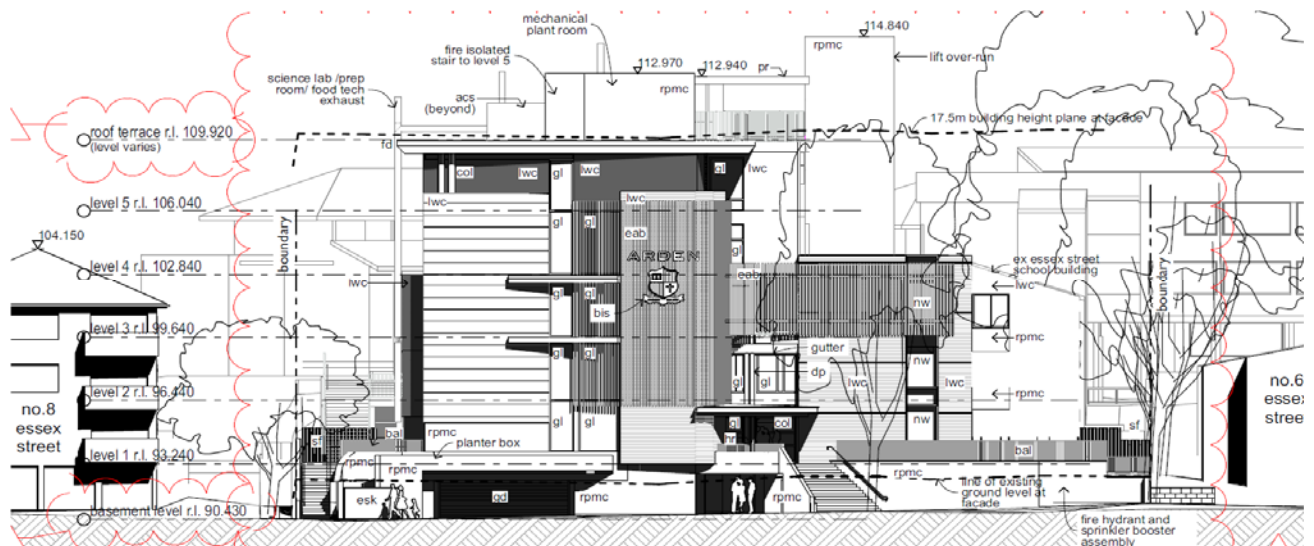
Proposed Essex Street elevation under DA/89/2017/C.
